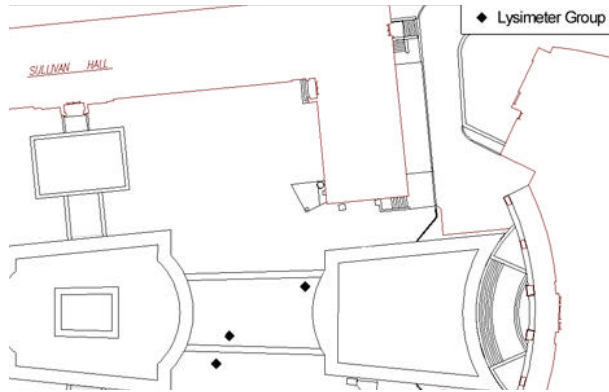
Location of Lysimeters for Pervious Concrete Site
